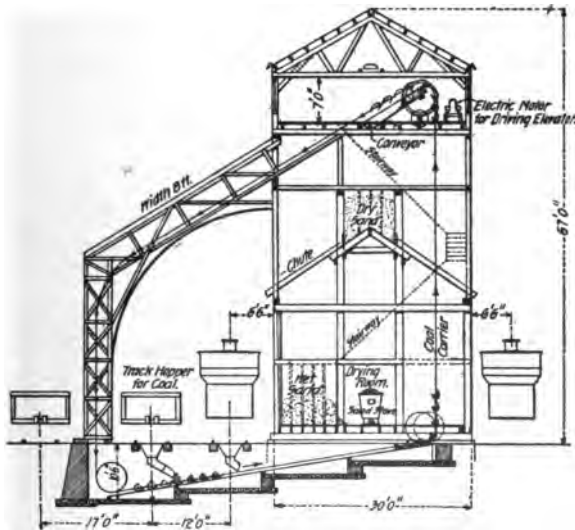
Cross-Section of Erie Coaling Plant at Jersey City.
